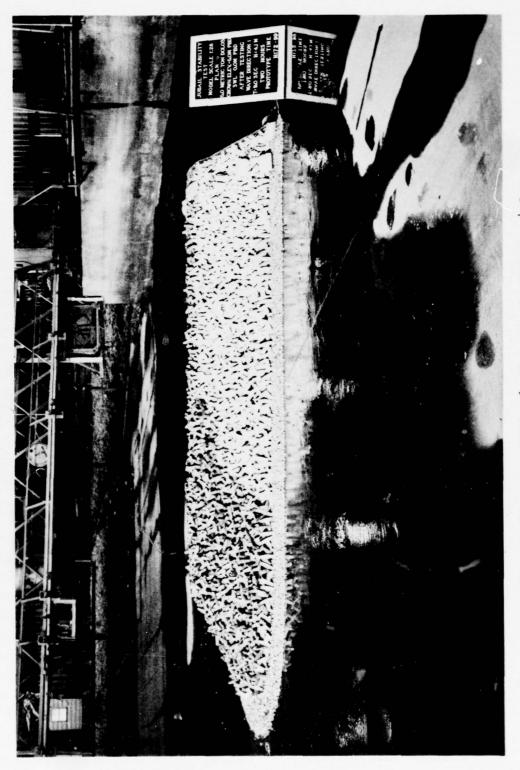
Seaside view of Plan 6 after attack of 9-sec, 4.1-m waves from wave direction 1
